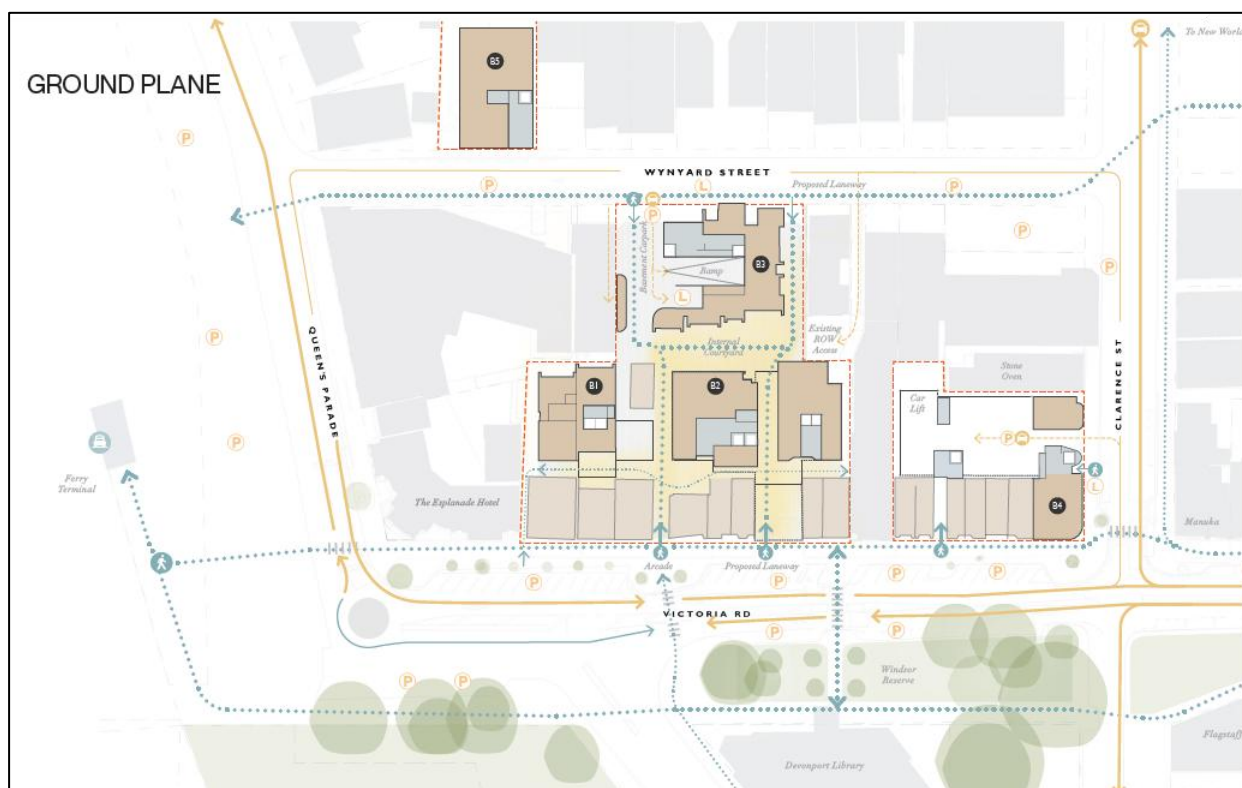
Ground plane plan showing pedestrian through connections and vehicular entry points
